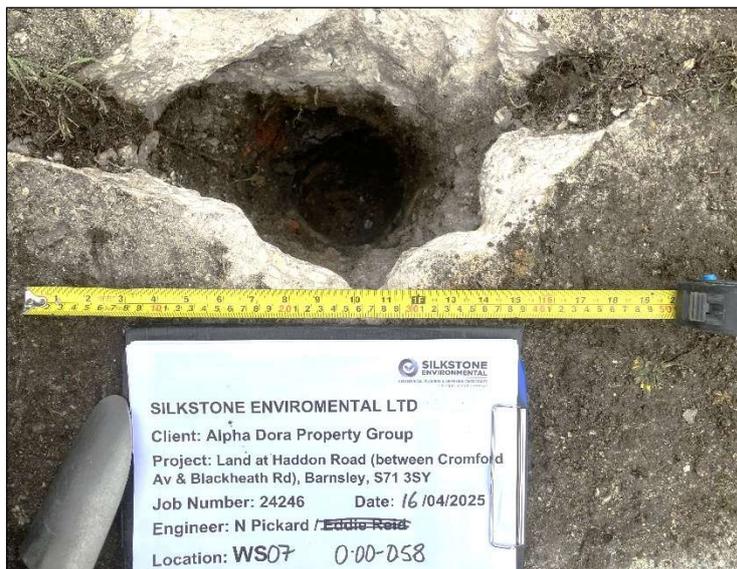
16/04/2025 WS07 – Hand dug inspection pit.
